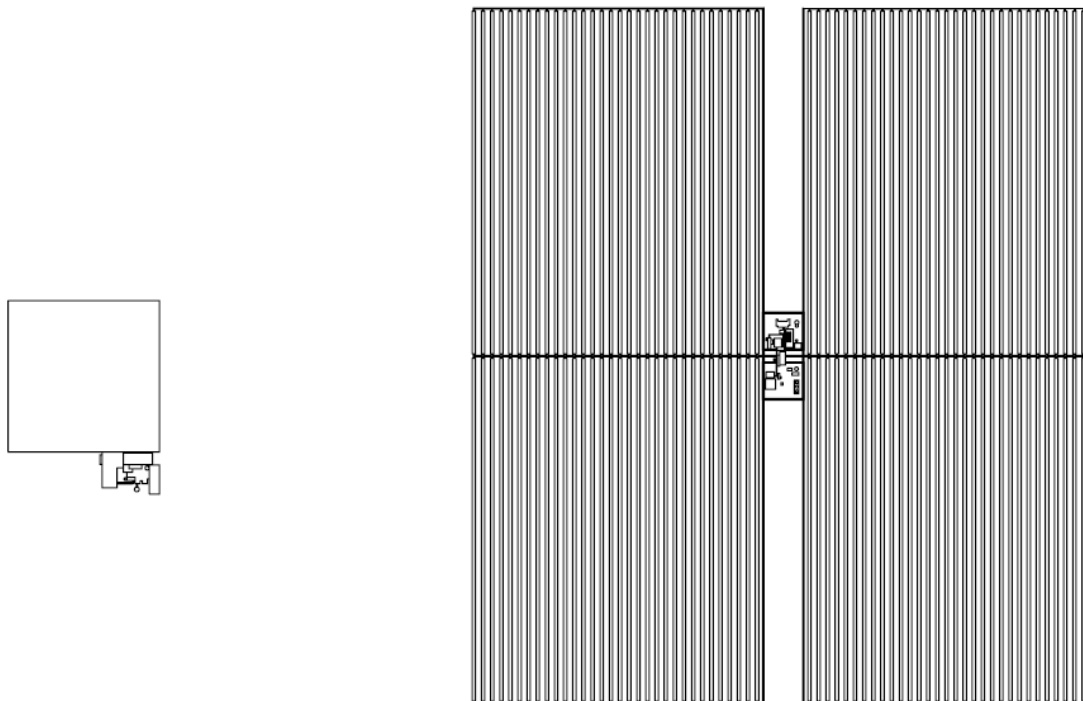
Layout of a parabolic trough power plant with a biomass boiler and storage facility.
